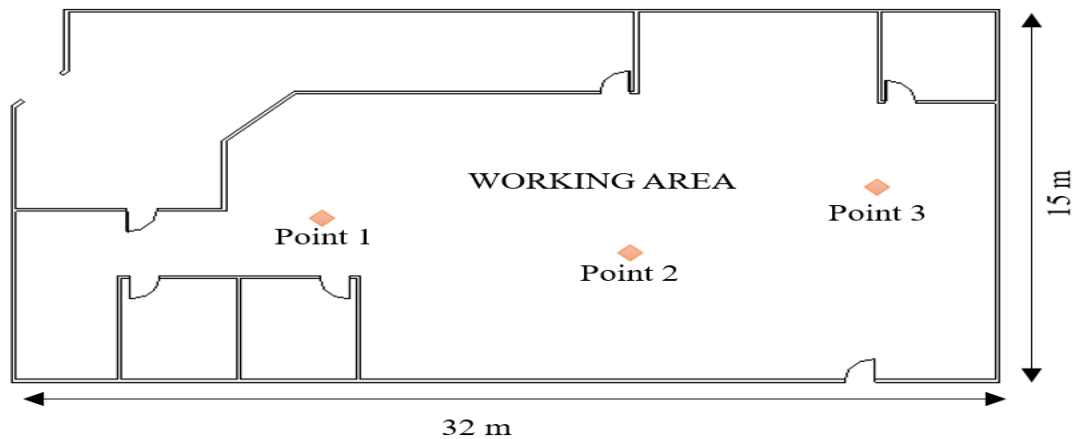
Layout Plan for Sample Points for IAQ Measurement (Office 2)
